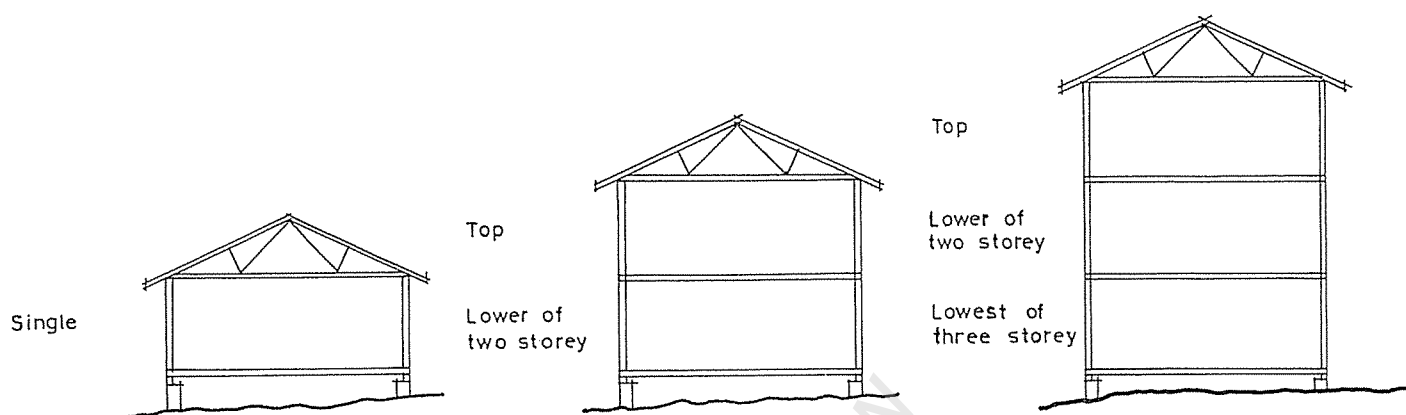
Location of wall framing for the purposes of tables 11, 12, 15, 18, 19 and 20.
